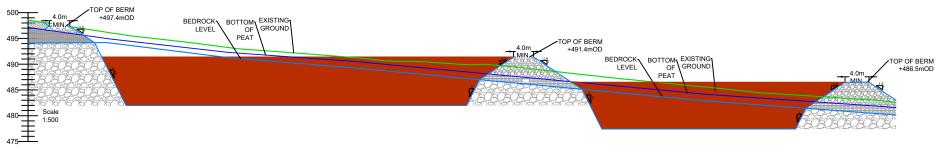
and Figure 4-11 below shows detailed sections through the proposed borrow pit and borrow pit extension respectively. The borrow pits will, on removal of all necessary and useful rock, be reinstated with excavated peat and subsoils as described in Section 4.3.6.2 below.
